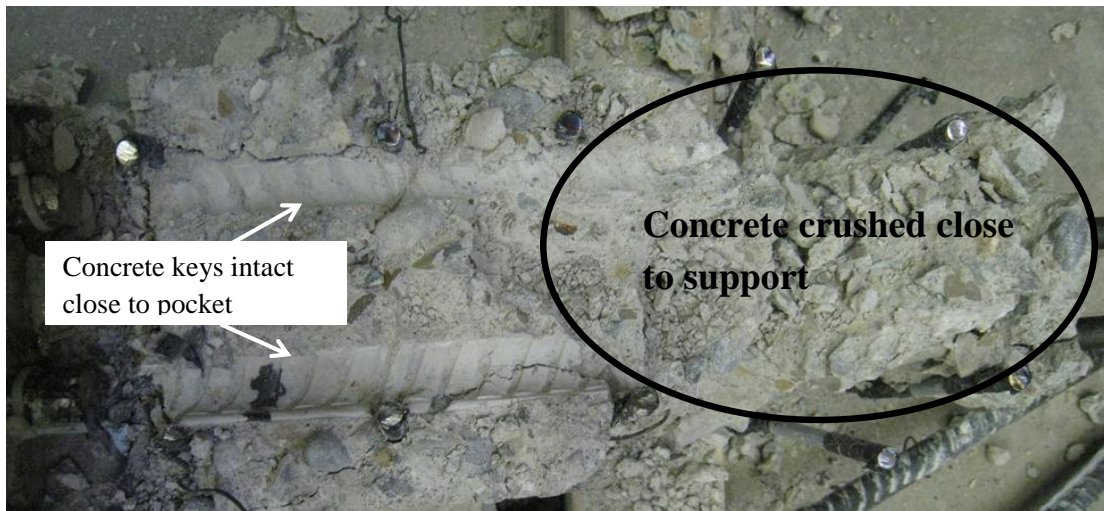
Beam F-B-97-0 after failure and removing the reinforcing bars. The beam was turned upside-down.
